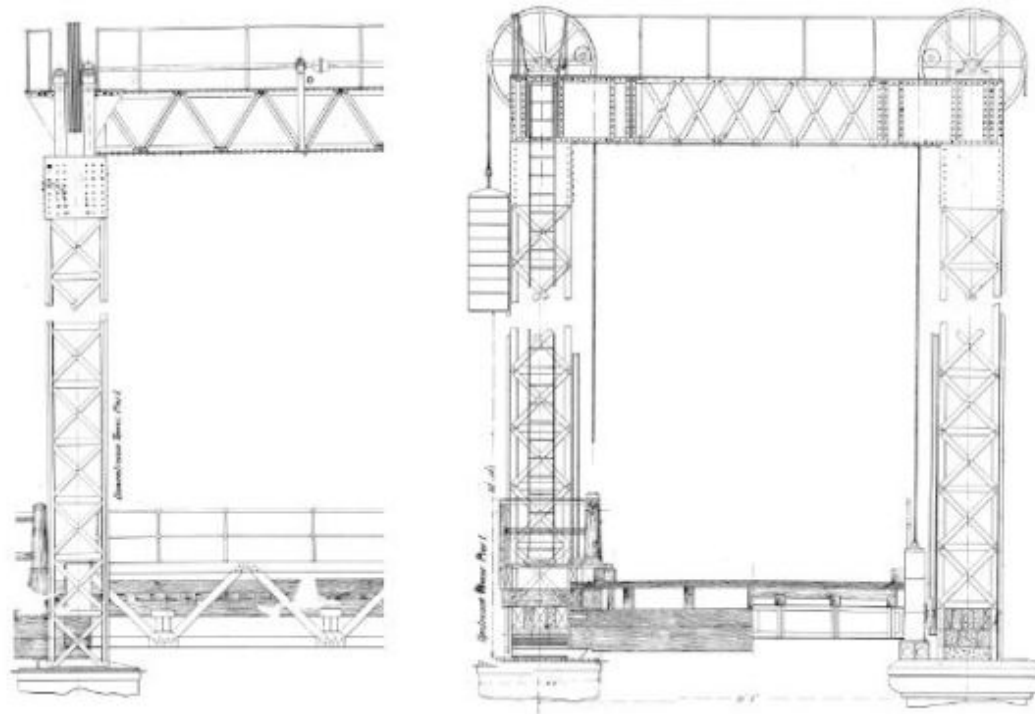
Drawing of lattice towers, transverse and longitudinal girders on Swan Hill Bridge
